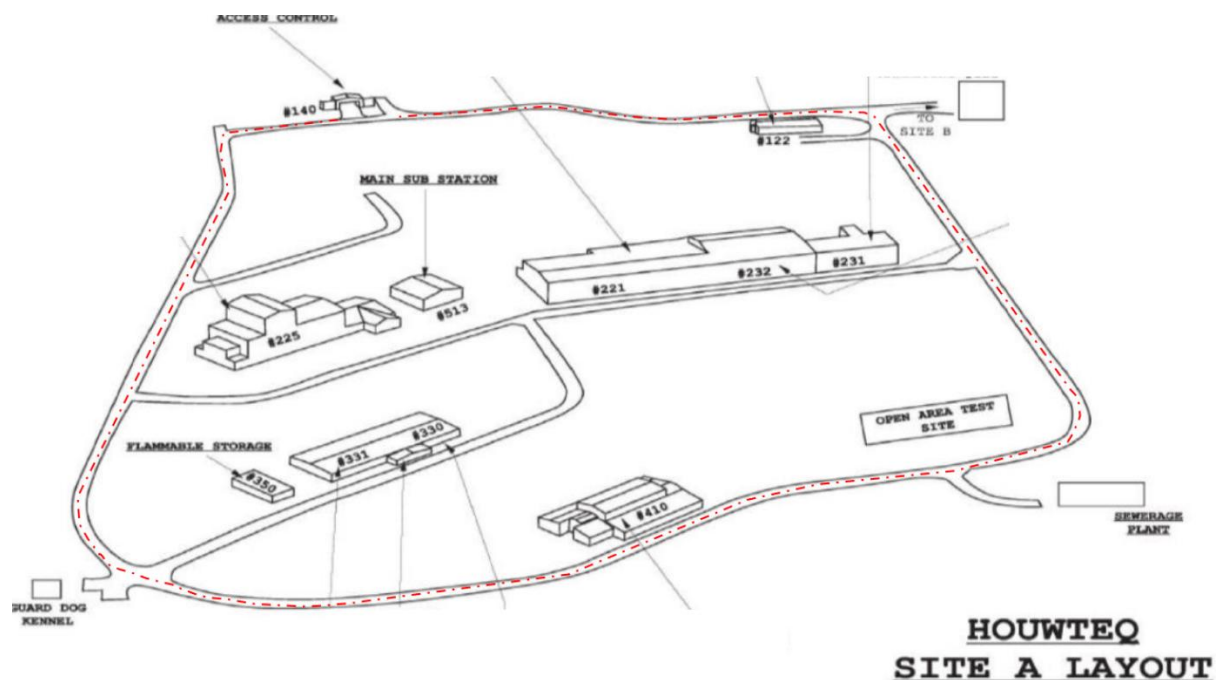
Houwteq AIT facility Site A - layout of existing perimeter fence
